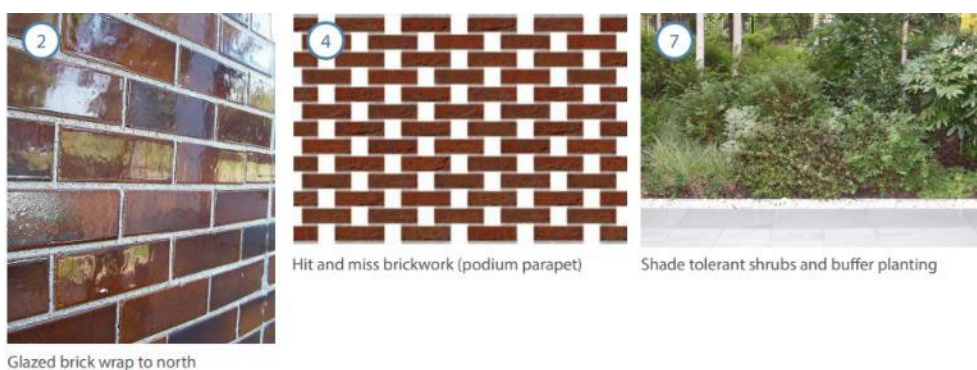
Shows glazed bricks, hit and miss brickwork and planting.
